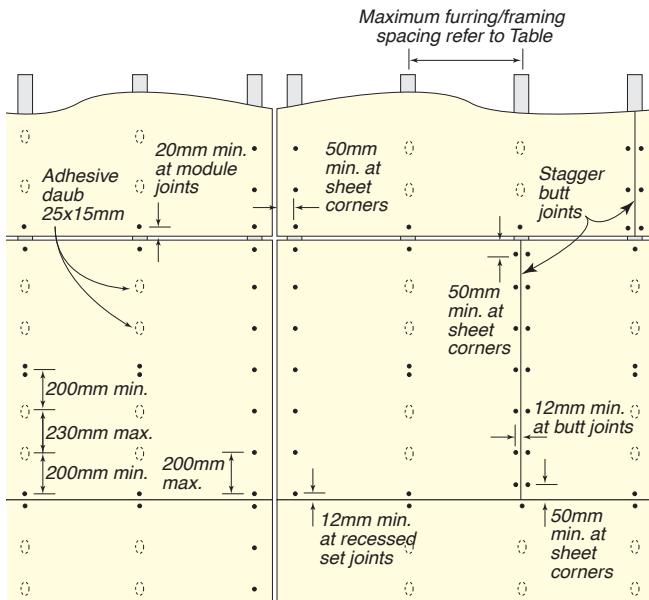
Fastener Fixing System for Exterior Flush-set Ceiling Systems
